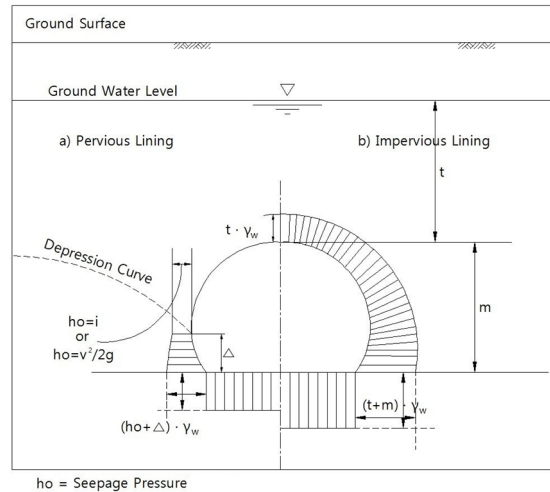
External water pressure at concrete lining of drainage or undrainage tunnel
